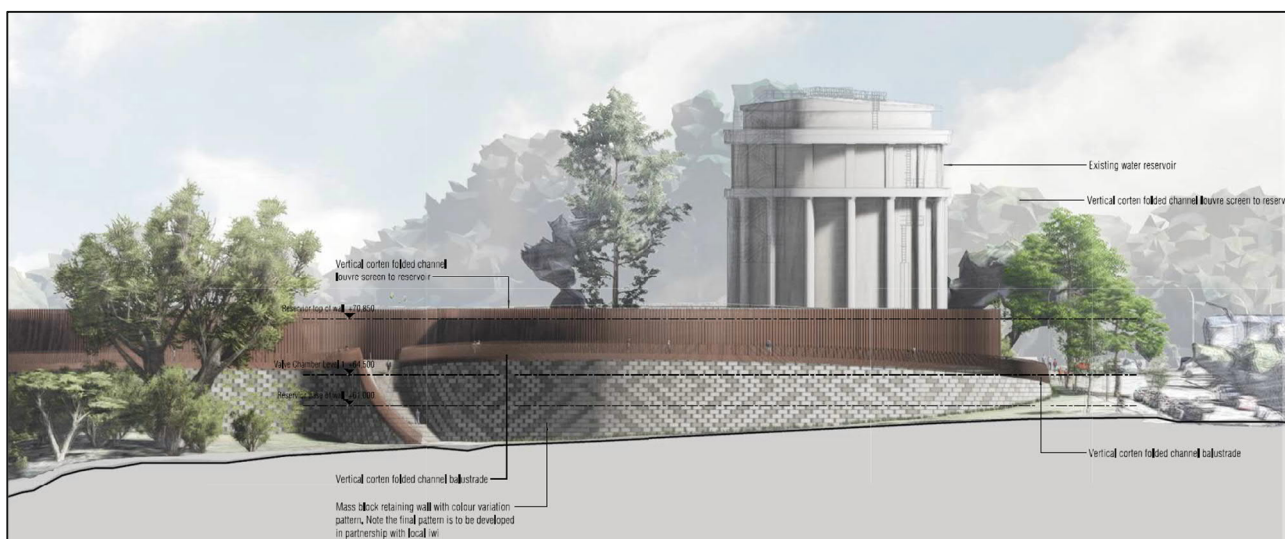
South-west elevation featuring stairs to elevated walkway around reservoir 1
